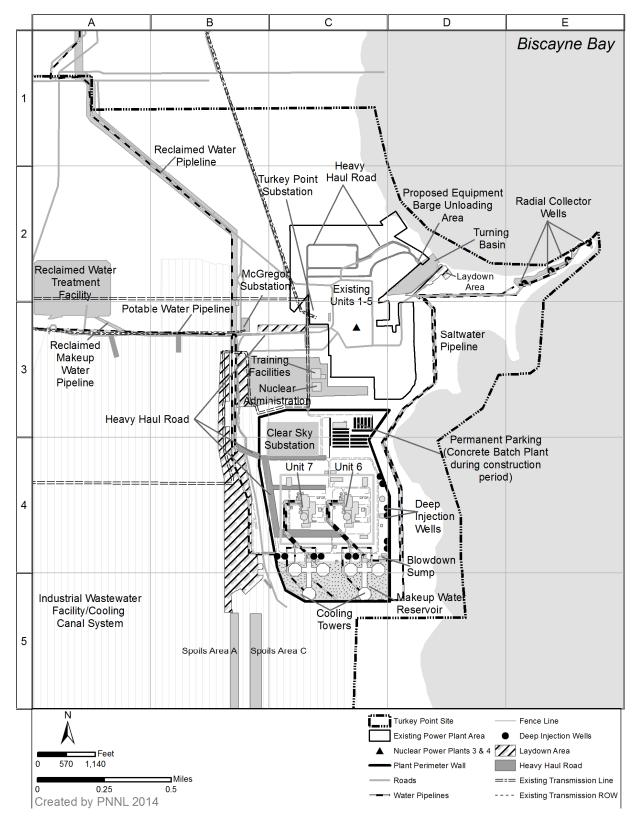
Site Layout for Proposed Turkey Point Units 6 and 7 and Associated Facilities
